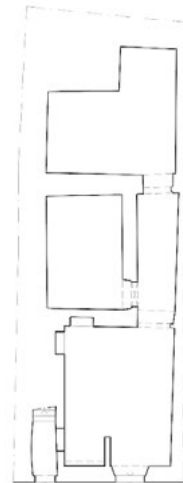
Groundfloor plan. Rua do Afã 12, Estremoz (Source: Rosado, 2021).
